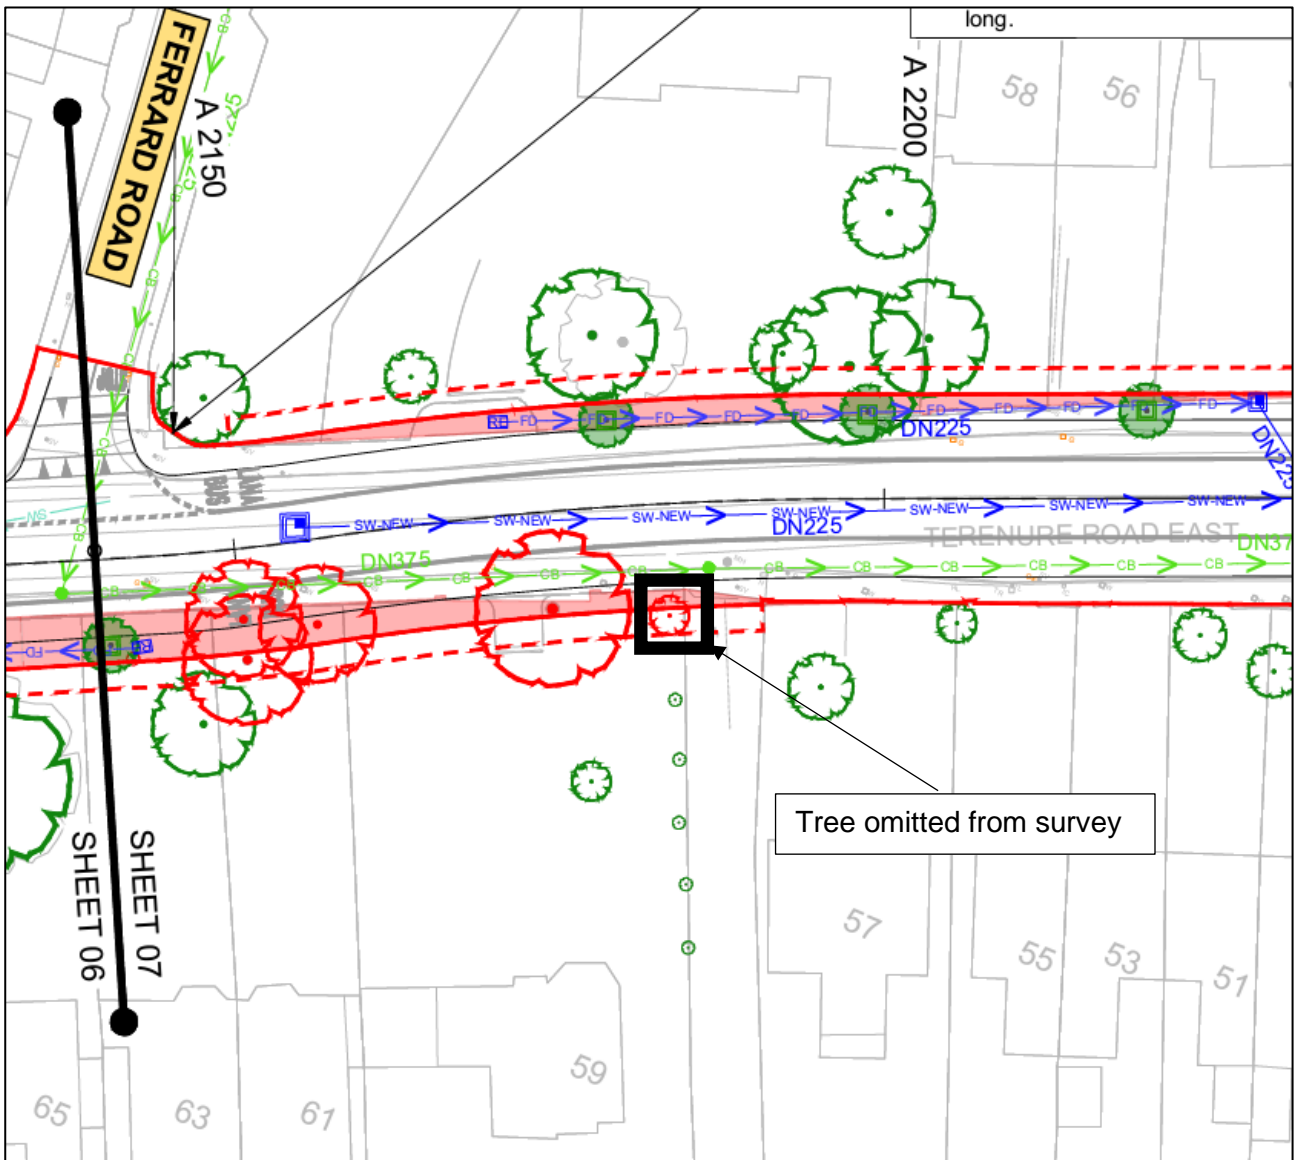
Extract from Proposed Surface Water Drainage Works drawings (Sheet 7)
